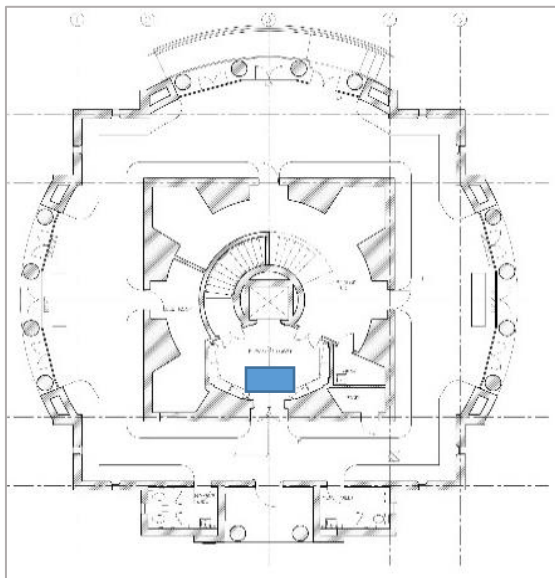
Blue rectangle shows location of pooling water under first floor elevator door before drainage.
